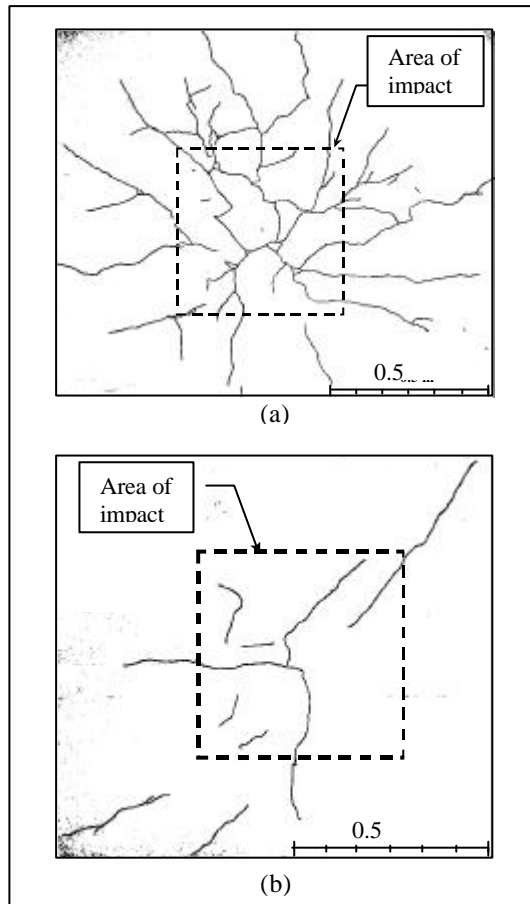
Typical cracks under the point of impact: (a) Horizontal slab and (b) slanting slab.
